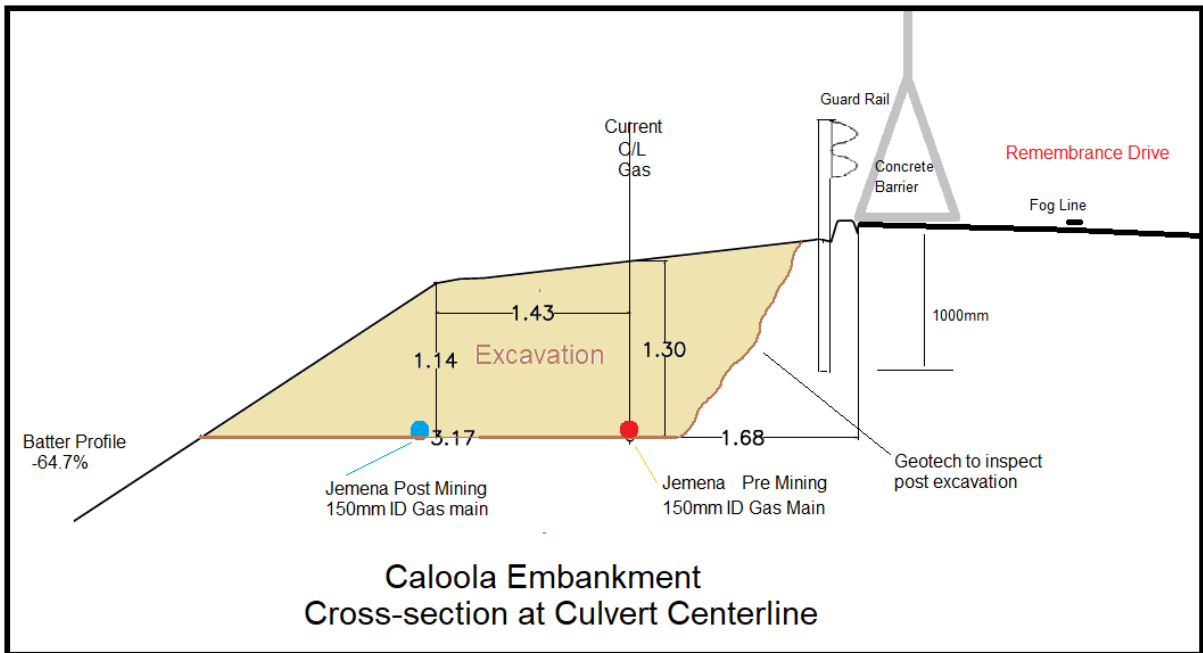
Cross-section showing planned mitigation works for the sharp bends and Teatree Hollow crossing in the Remembrance Drive embankment at Caloola Road intersection
